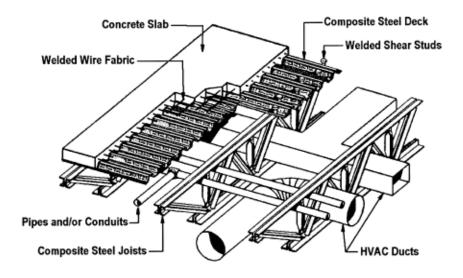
Composite Steel Joist System (Samuelson 2002)
